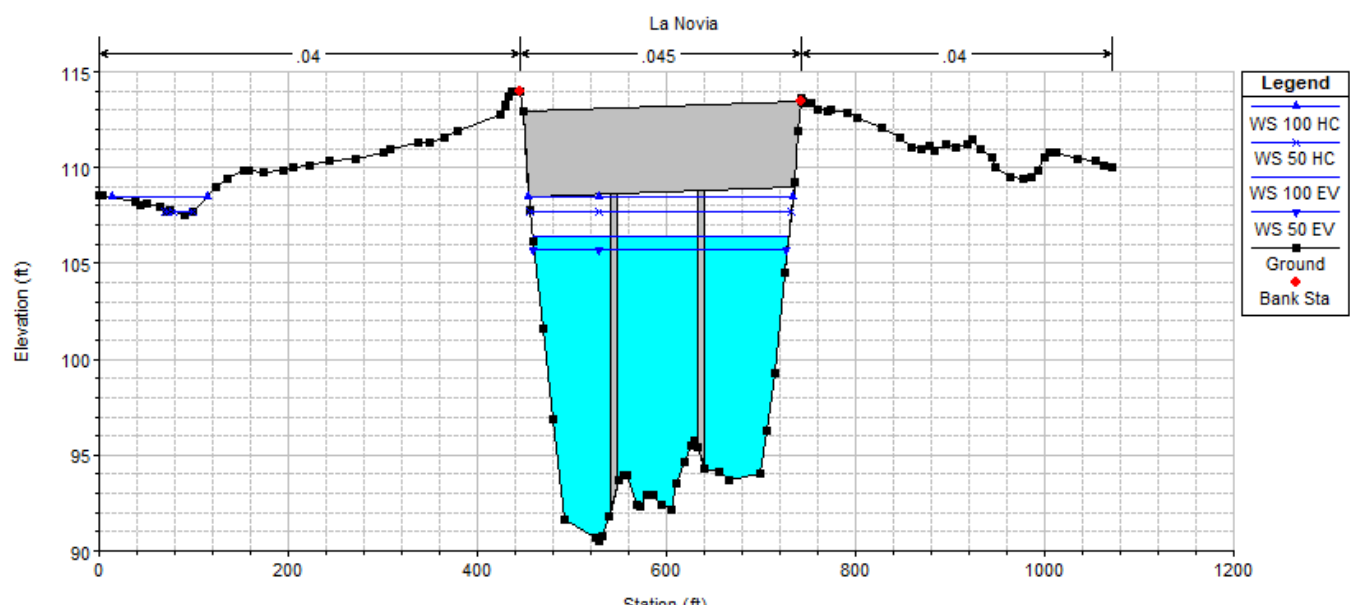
Widened La Novia Bridge Upstream Section (OCPW Flow Rates)
